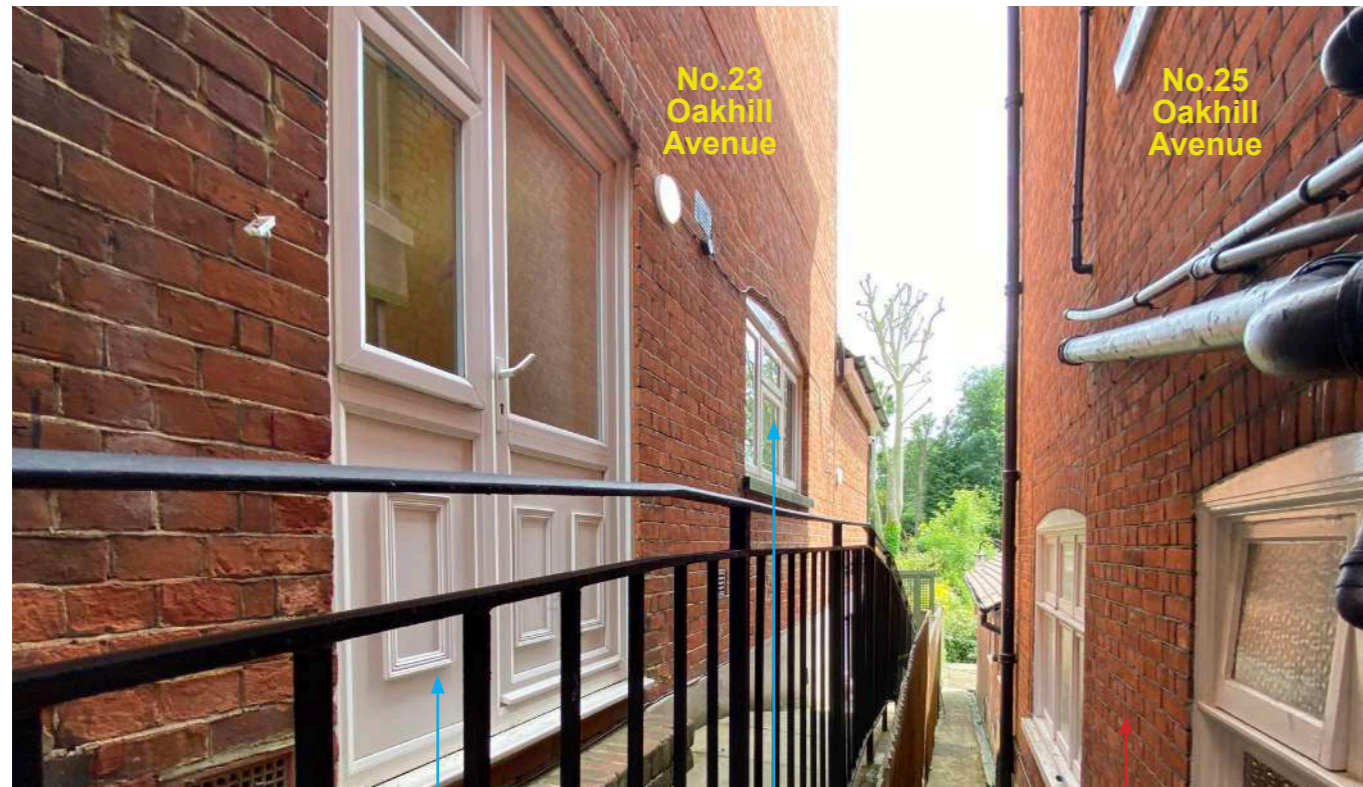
Side elevations of no.23 and no.25 Oakhill Avenue.
